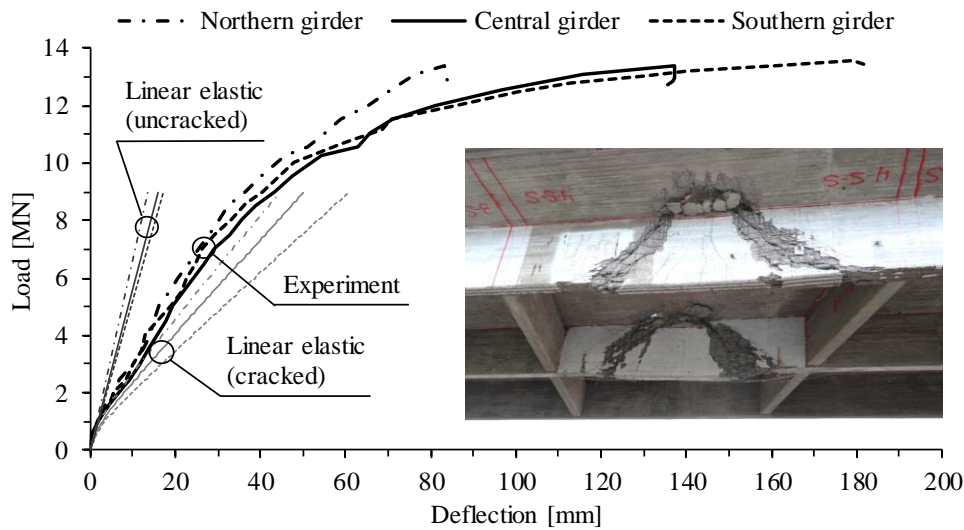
Load-deflection relationship for the test of the bridge's girders and photo of south and central girders after shear-bending failure.
